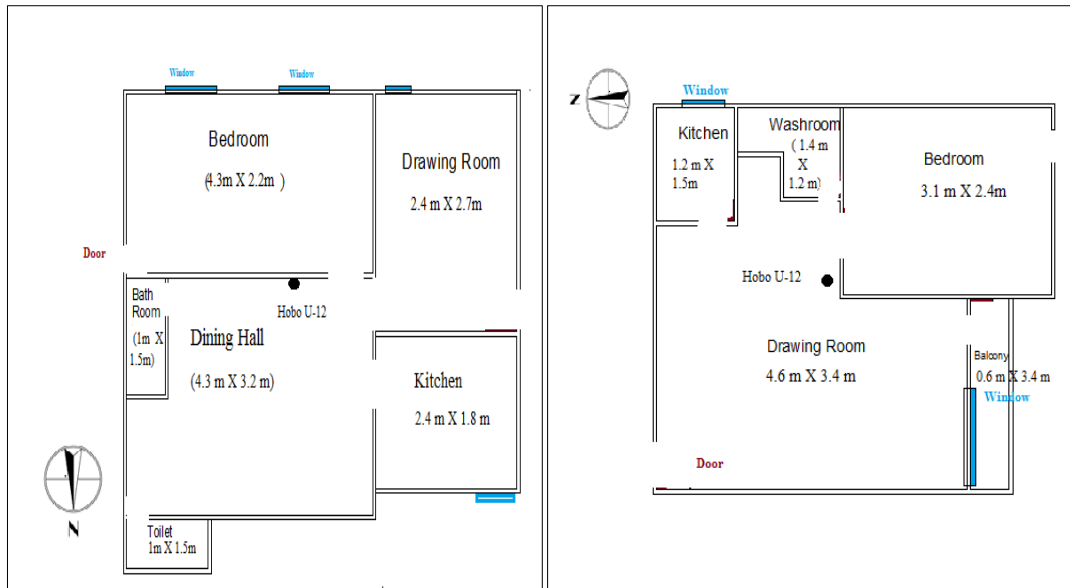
Plan layout of monitored high thermal mass residential buildings (a) stone wall construction (b) brick wall construction
